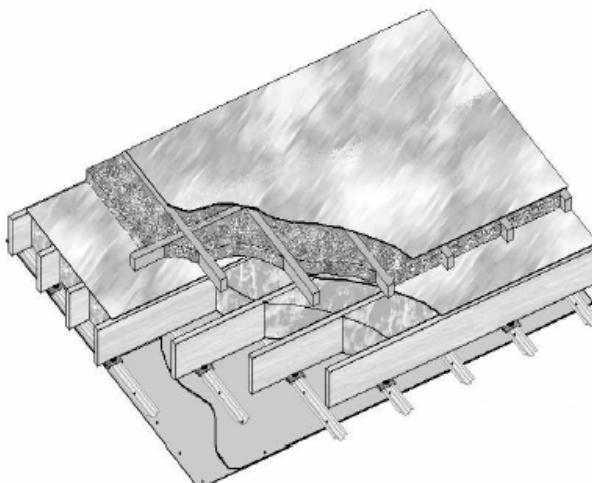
Schematic drawing of the floor/ceiling structure. This structure has the same components as figure 1, plus an added layer of sand-saw dust mix on top.
